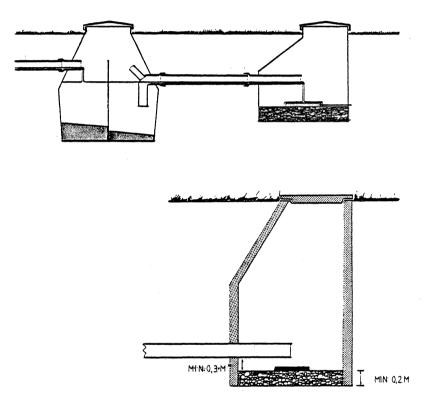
Seepage Pit (for Buildings without Water Closet only).
